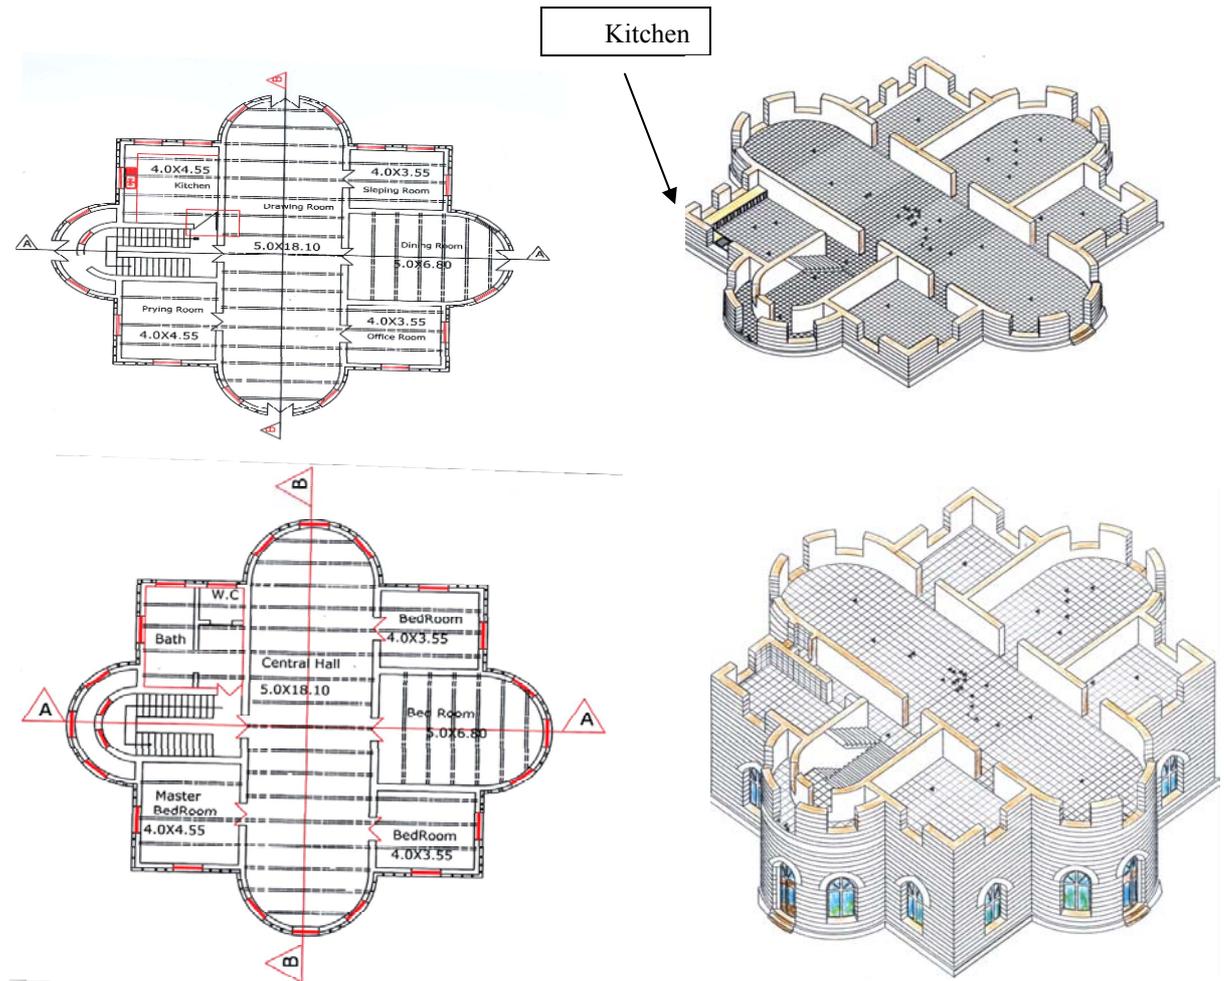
Top left: plan of the ground floor; top right: 3D view of the ground floor after rehabilitation; below left: plan of the first floor; below right: 3D view of the first floor after rehabilitation.
